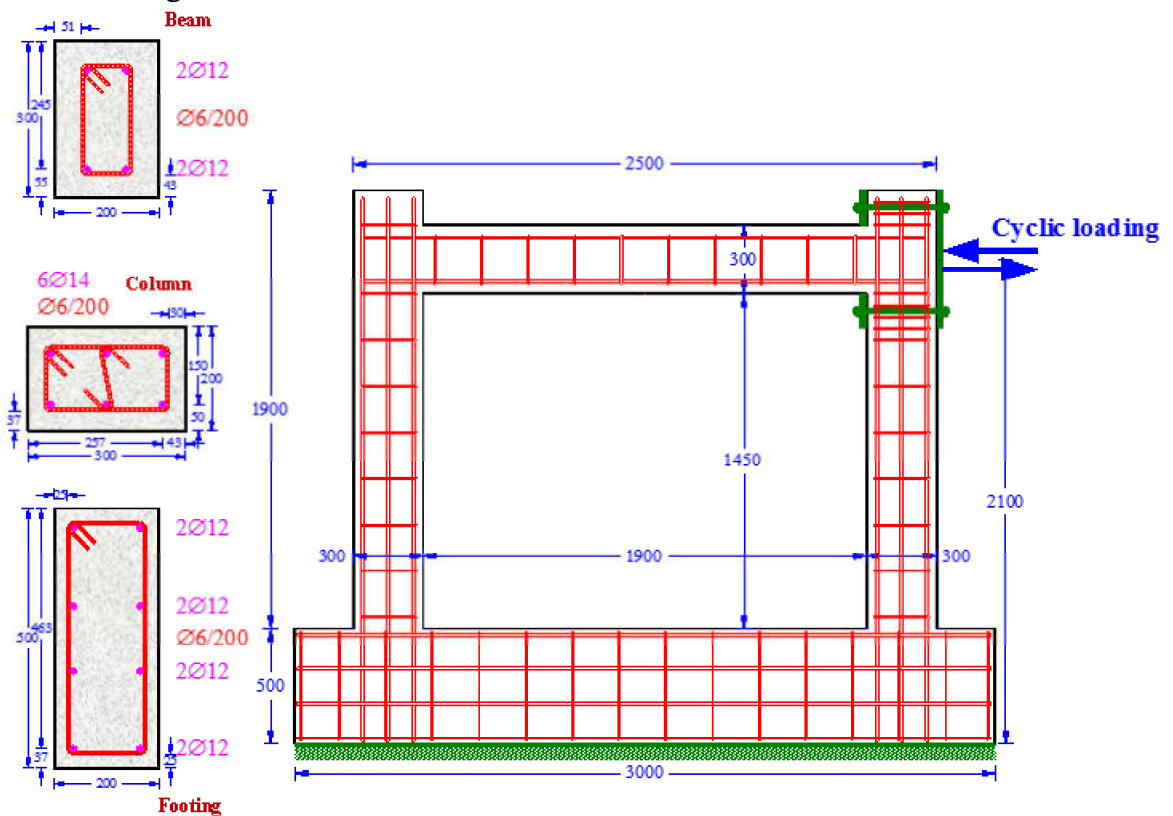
Dimensions and reinforcement configurations of the bare test-specimen [12, 13].
